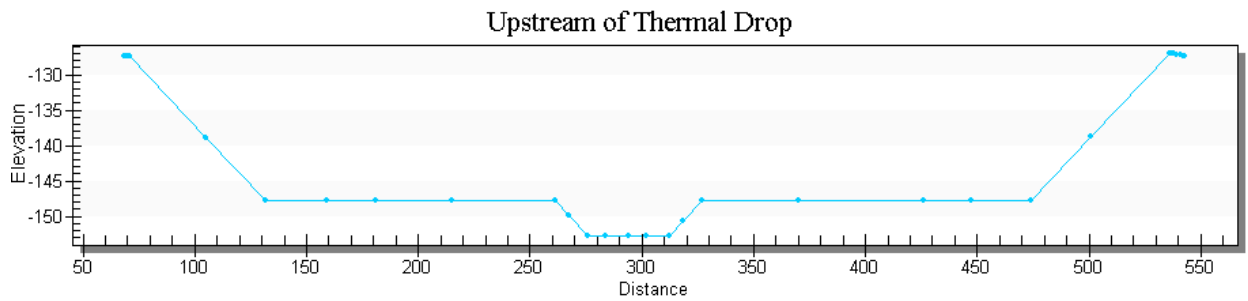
Section view of the proposed project upstream of the existing Thermal Drop Structure.
